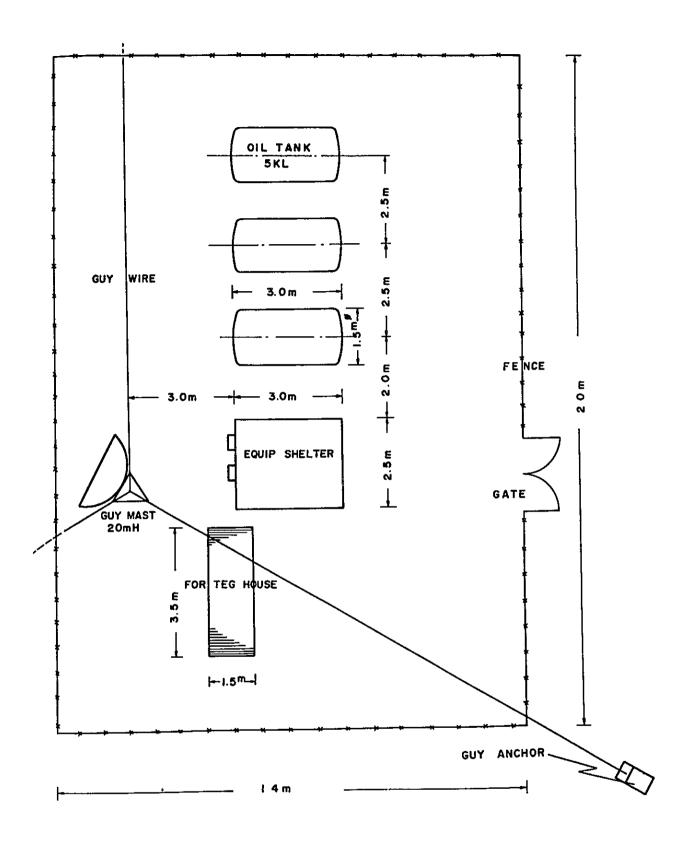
Typical Site Layout for UHF Repeater (1/2)
